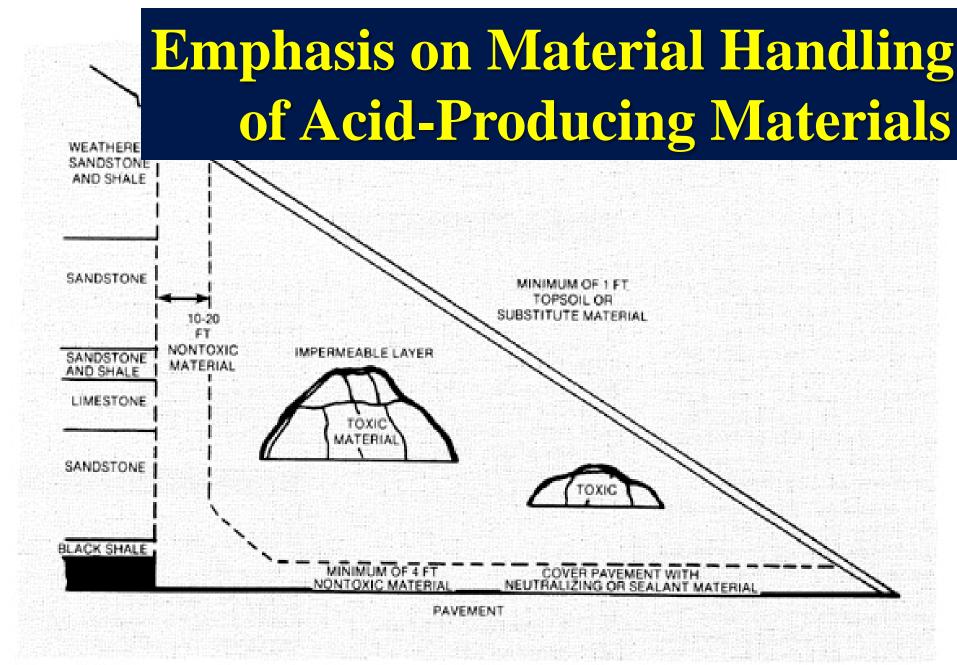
During construction of the backfill, toxic material should be placed off the pit floor, compacted, treated with neutralizing material, and capped with an impermeable layer to reduce air and water contact.
